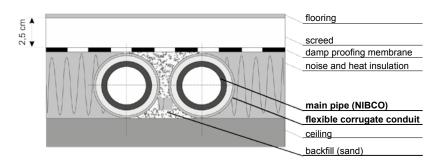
Laying installation in a flexible corrugate conduit (e.g. through ceiling)
